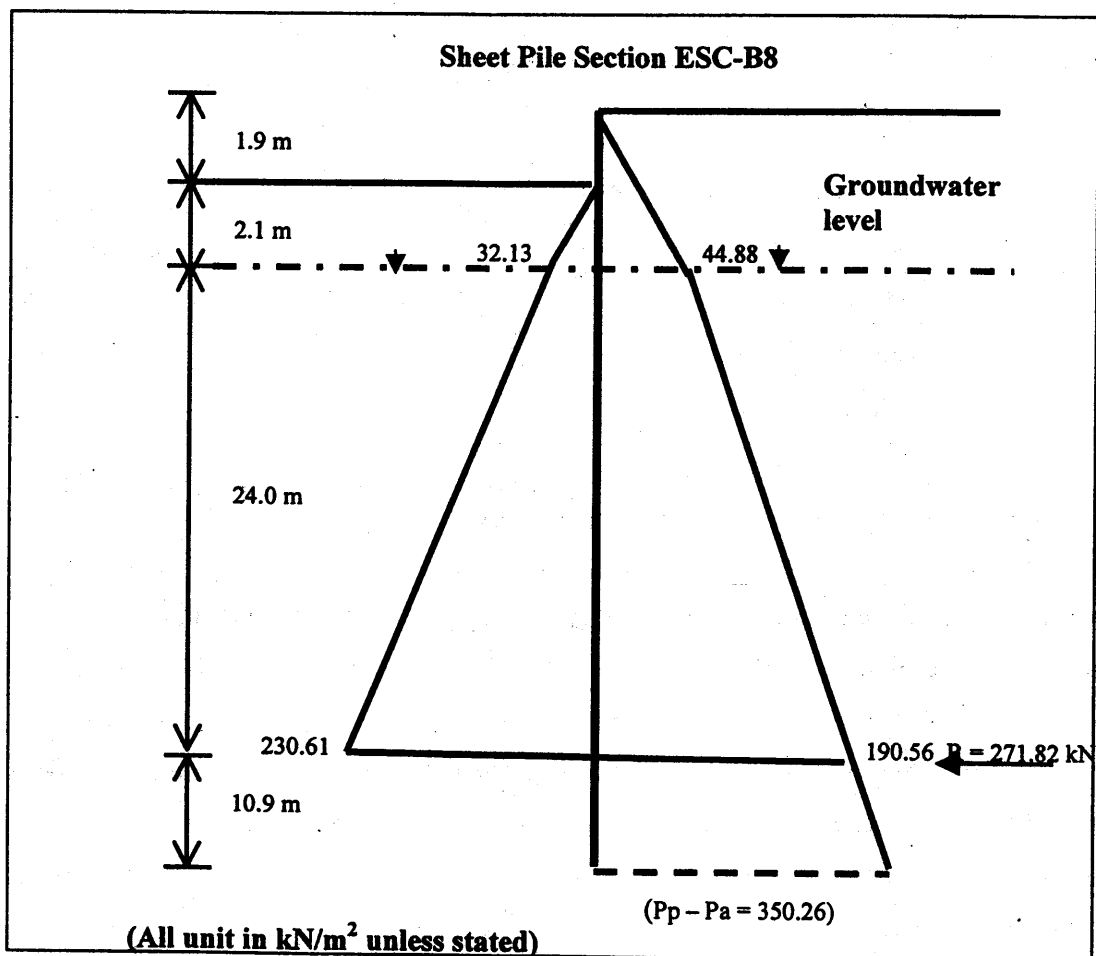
Analyzed pressure distribution at depth of penetration, D'
